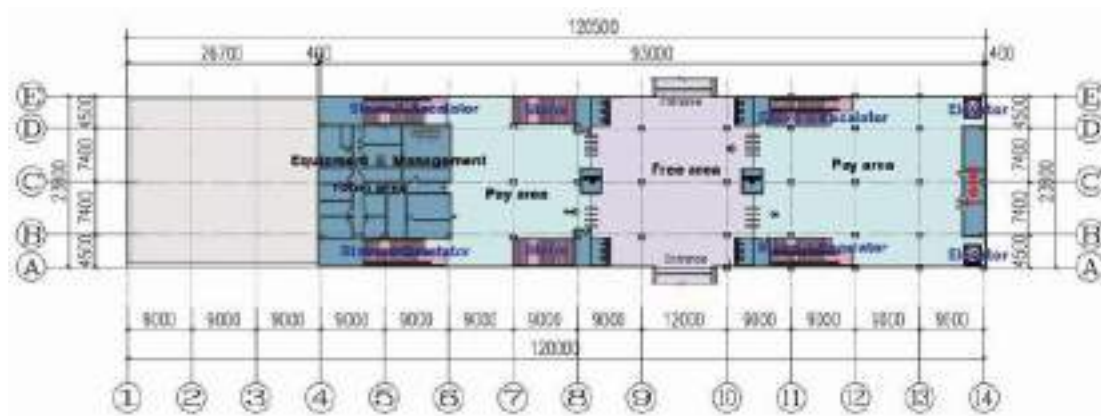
Plan of Typical First Floor (Concourse Level)
